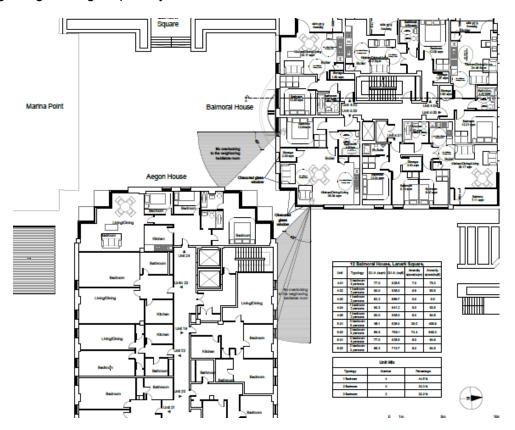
Relationship of the application building to Aegon House at 4th floor level
